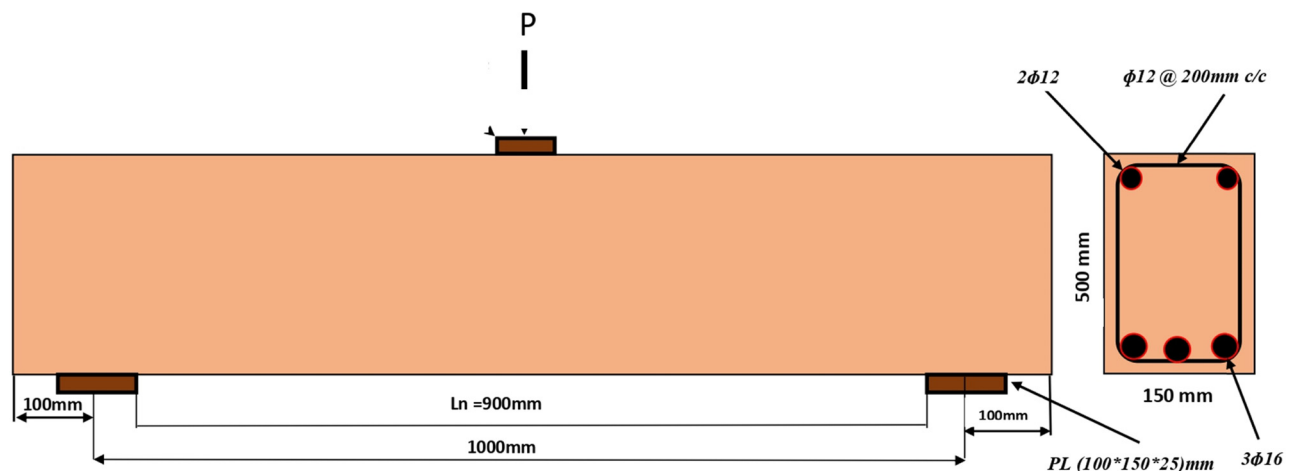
Specifications of tested reinforced concrete deep beams with and without RPC.
